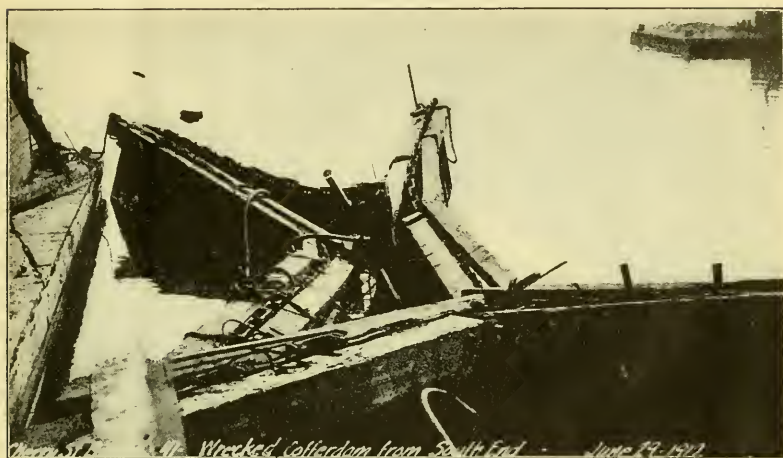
WRECKED COFFER-DAM OF PIER II, FROM SOUTH END.
